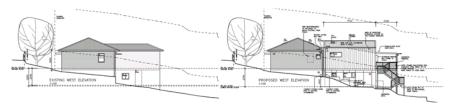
West (side) elevation (Steven Spizick Architect, 2021)
